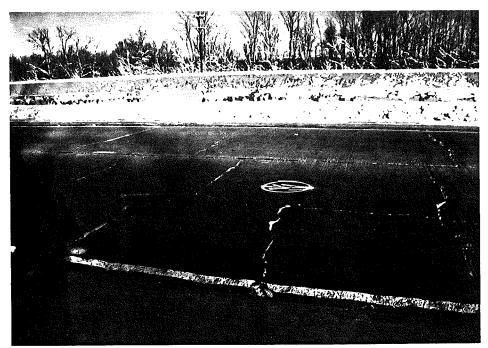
Pavement in the East bound test section (MI2-2). Notice the shattered slab and the spalling at the cracks.
